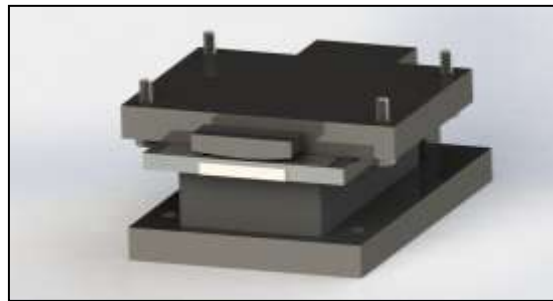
Section through the guided sliding uplift bearing, with the vertical plate of one uplift clamp removed. The horizontal upper part of the clamp is shown, with curved lower surface allowing rotations of the sliding plate it holds down.
